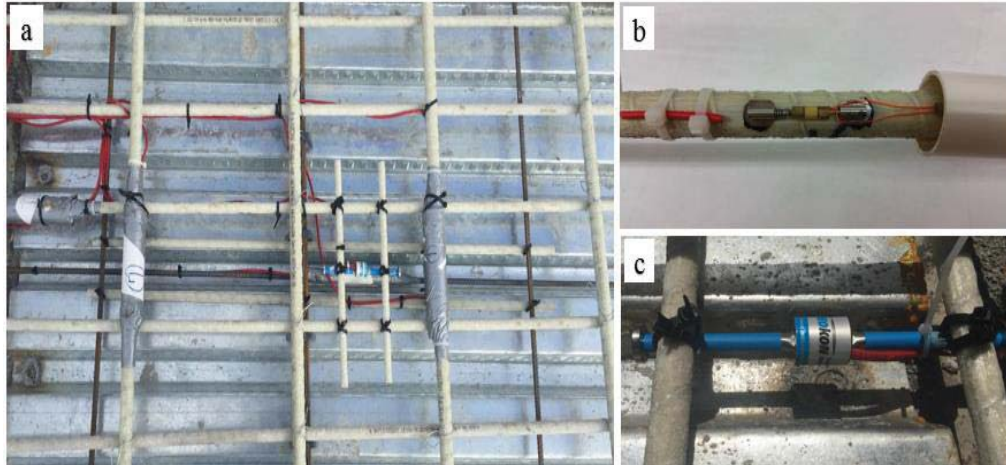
Vibrating wire gauges installed at the deck of the Fate Bridge (a), zoomed view of the sensors used for the GFRP (b) and concrete (c)
